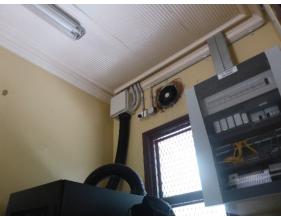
Interior of the store room (former booking office) showing an ETS primary enclosure for equipment and conduits leading into original corrugated iron ceiling.
